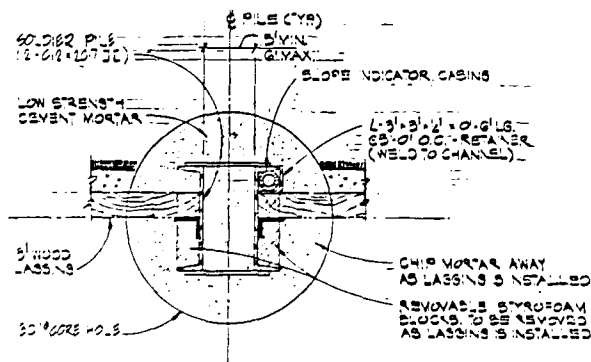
(a) Detail - Soldier Pile and Wood Lagging
